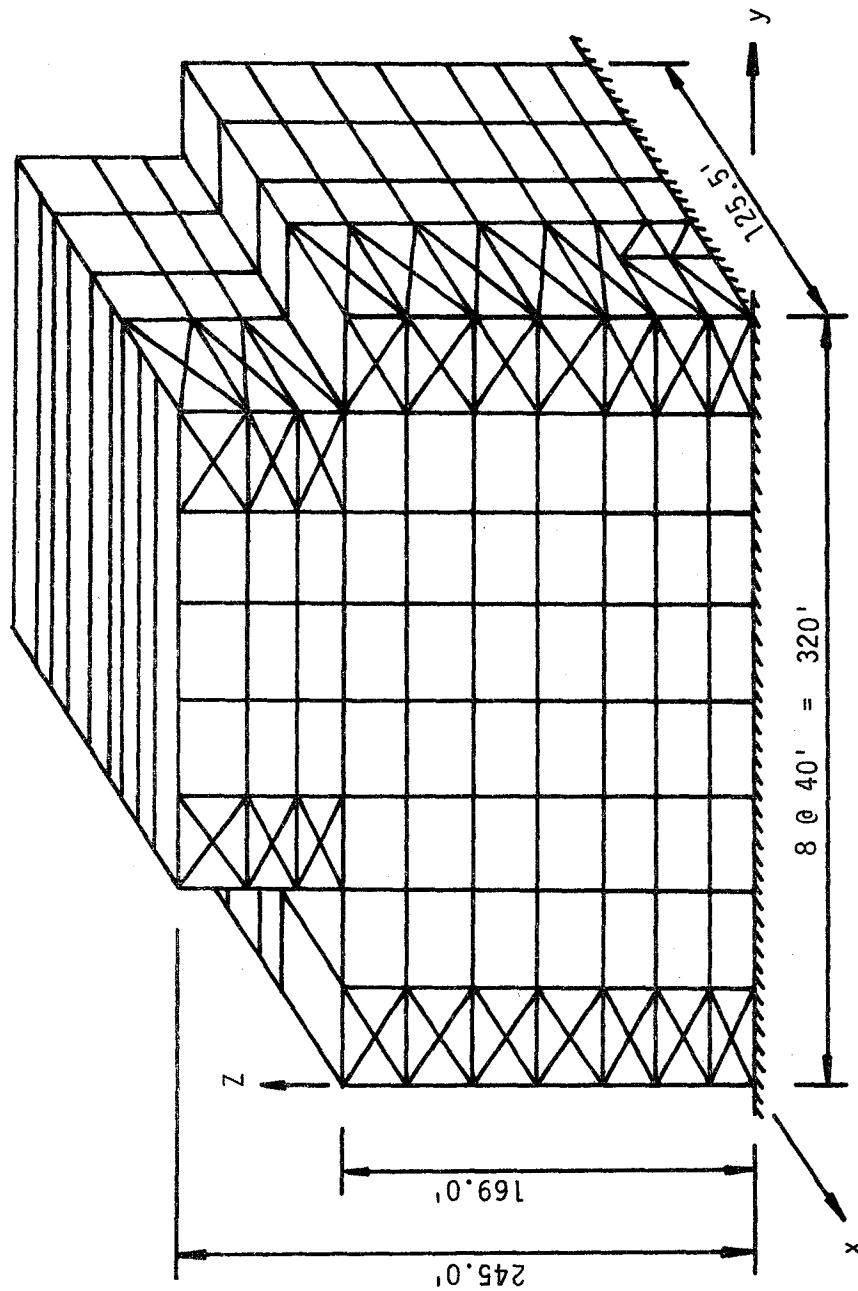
A three-dimensional outside view of the steel supporting frame structure
